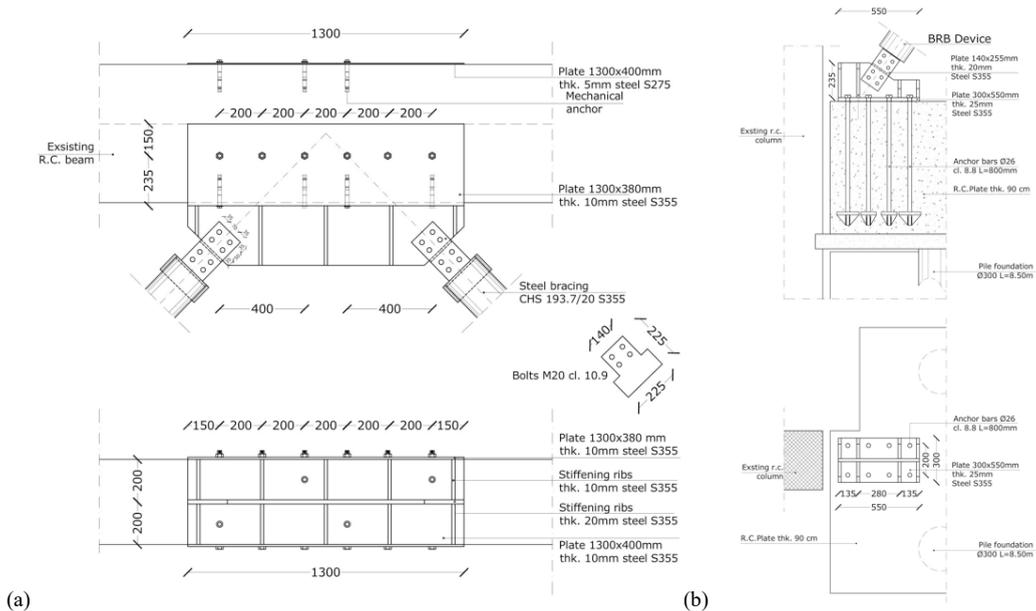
(a) Connection of damped brace to RC beam; (b) Connection of damped brace to foundations.
